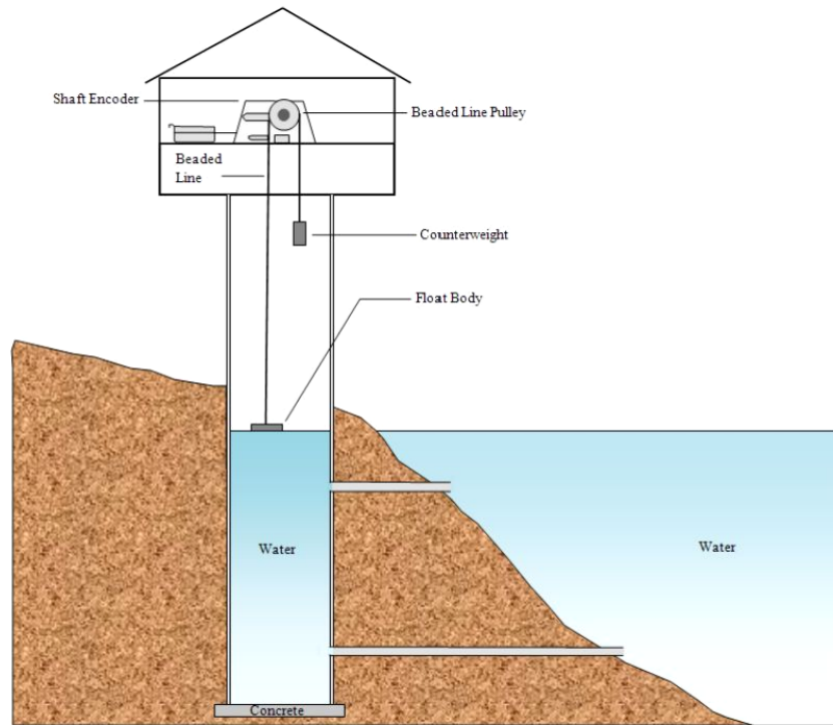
Typical Drawing for Float and Stilling Well Installation
